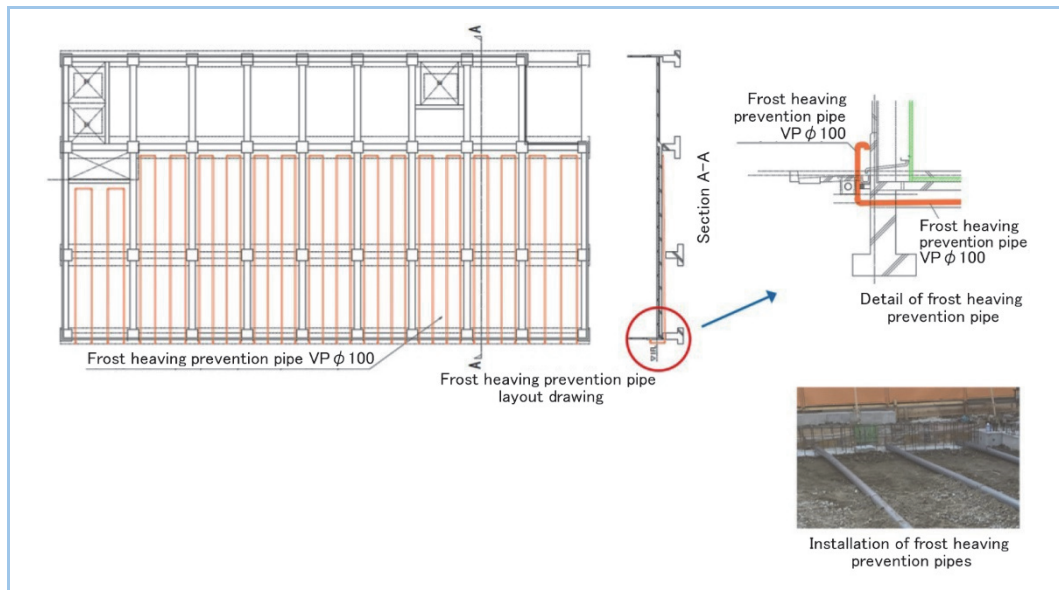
Frost heaving prevention pipe layout drawing and detail view
